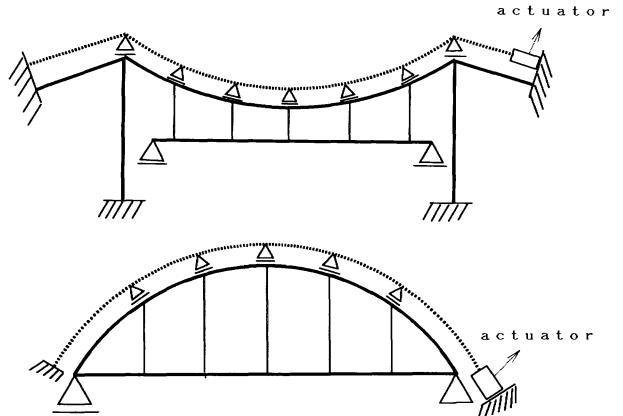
(a) A suspension bridge with a subwire; (b) an arch bridge with a subwire.
